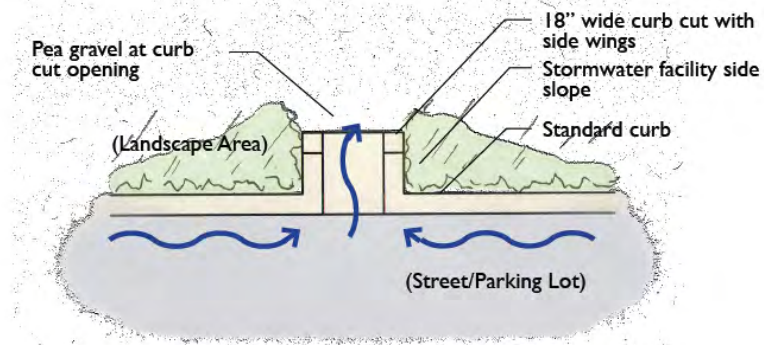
Standard curb cut with side wings: plan view (Source: SMCWPPP 2009)
